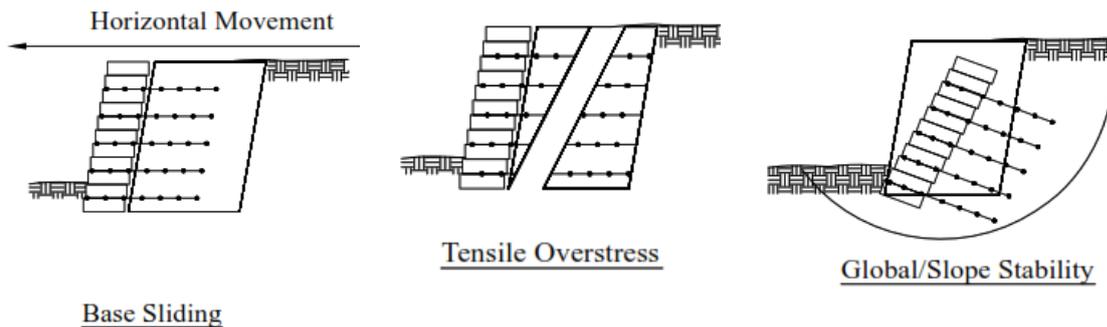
Potential failure mechanism for reinforced-soil wall (NCMA-2010)
